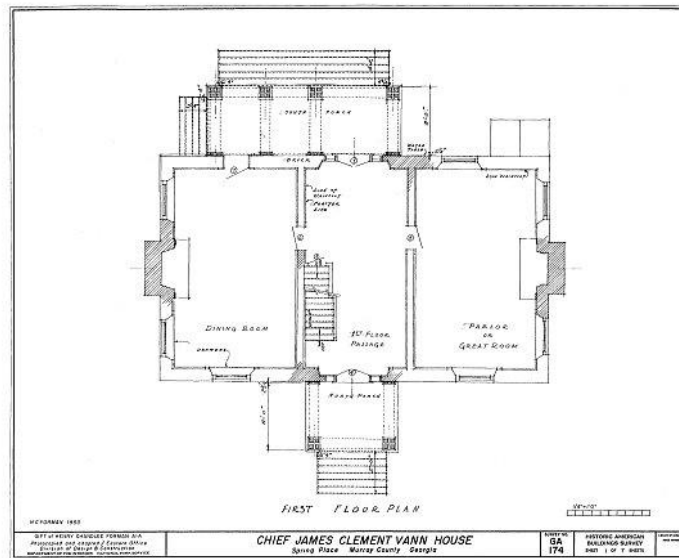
Chief Vann House First Floor architectural plan. Illustrating the front and rear porches, a central hall and stair with the dining room on the west side and the drawing room on the east side. –(HABS)
